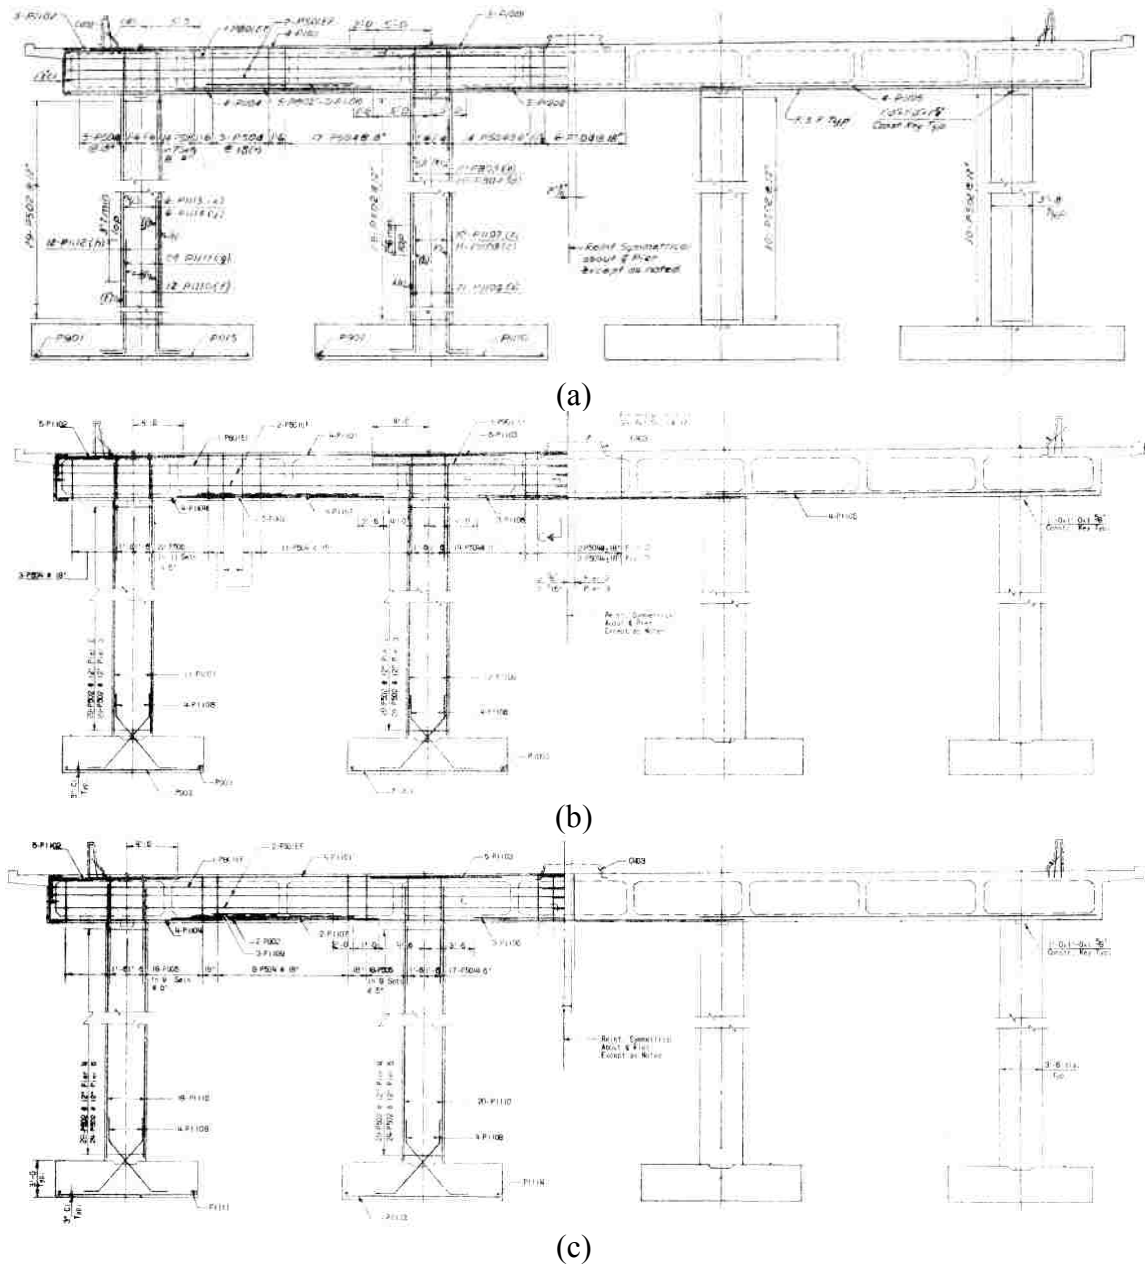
Bridge G-953 - Deck section at (a) bent 1; (b) bents 2 and 3; and (c) bents 4 and 5
